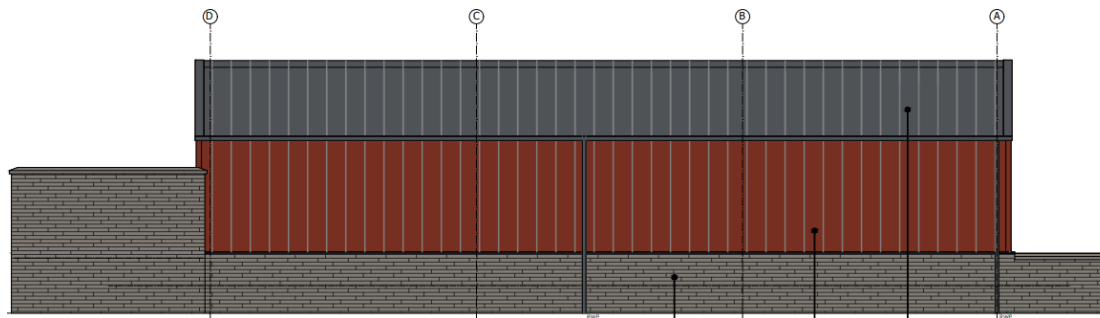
Proposed Cambria Building north elevation © Gaunt Francis Architects
